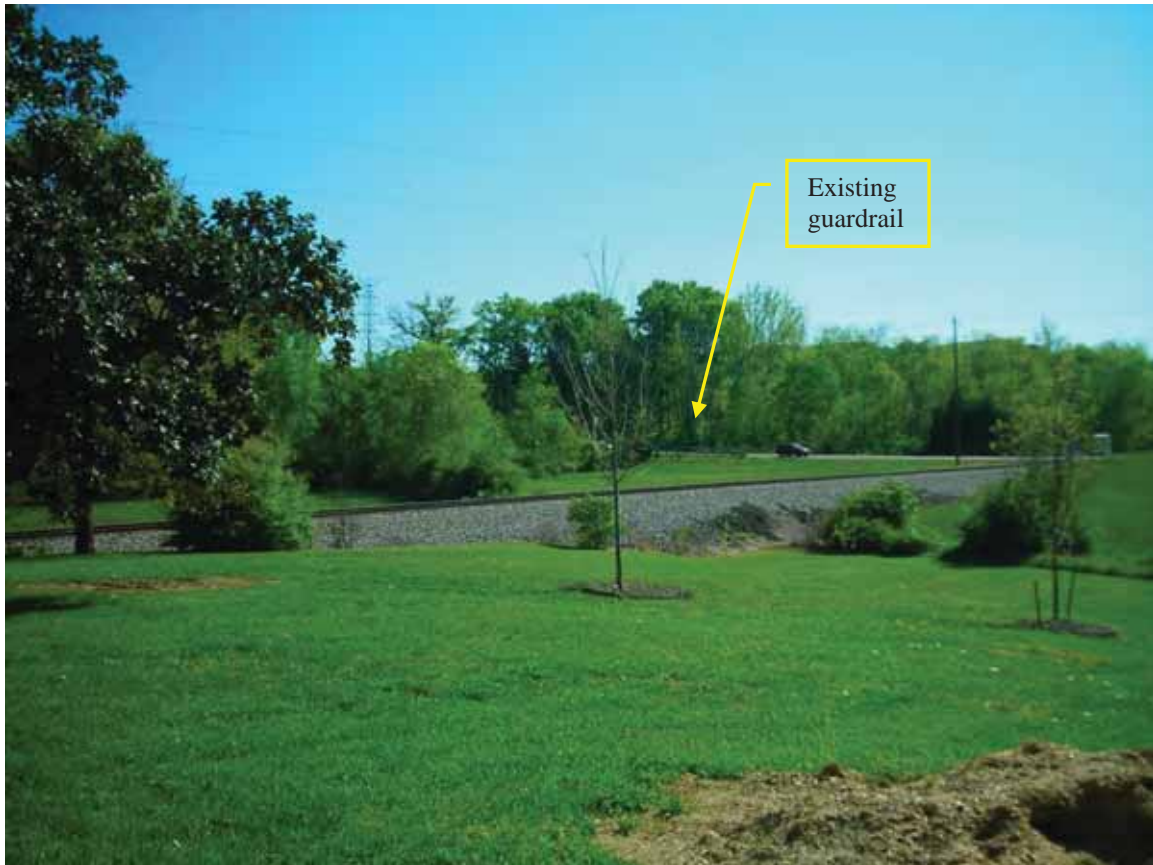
View from front façade of the Hugh Murphy House southwest across railroad tracks toward Murphy Road.
